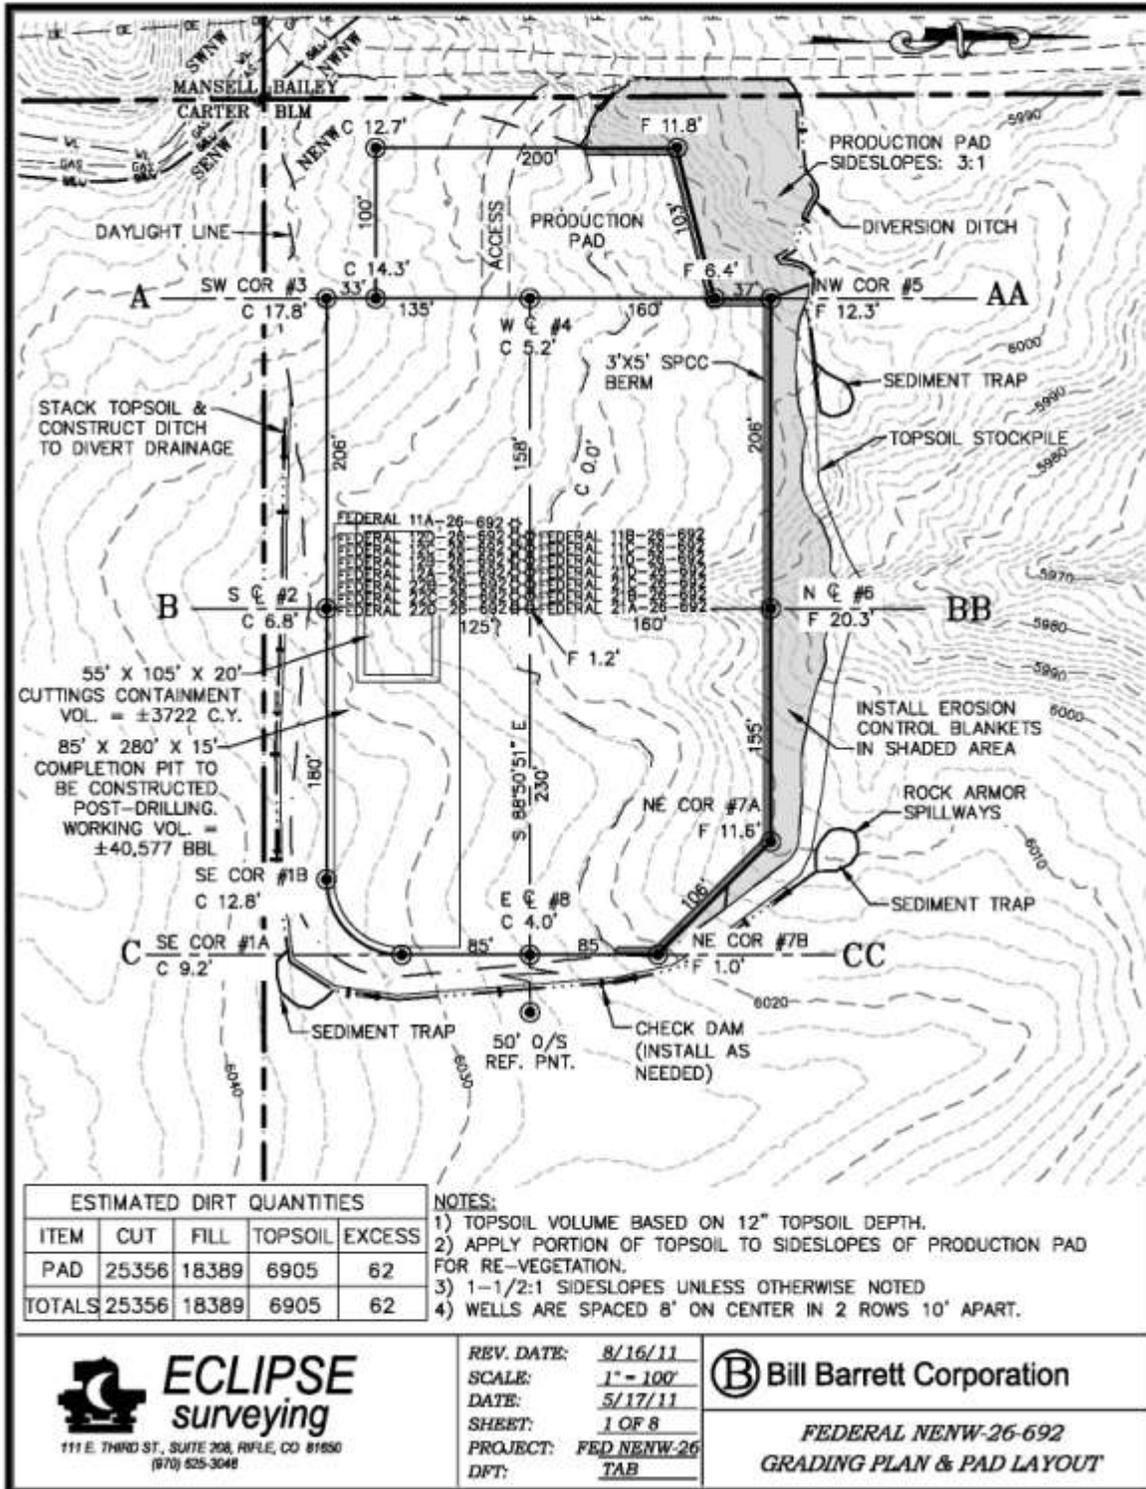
Federal NENW-26-692 Pad Construction Layout (BLM Surface).
